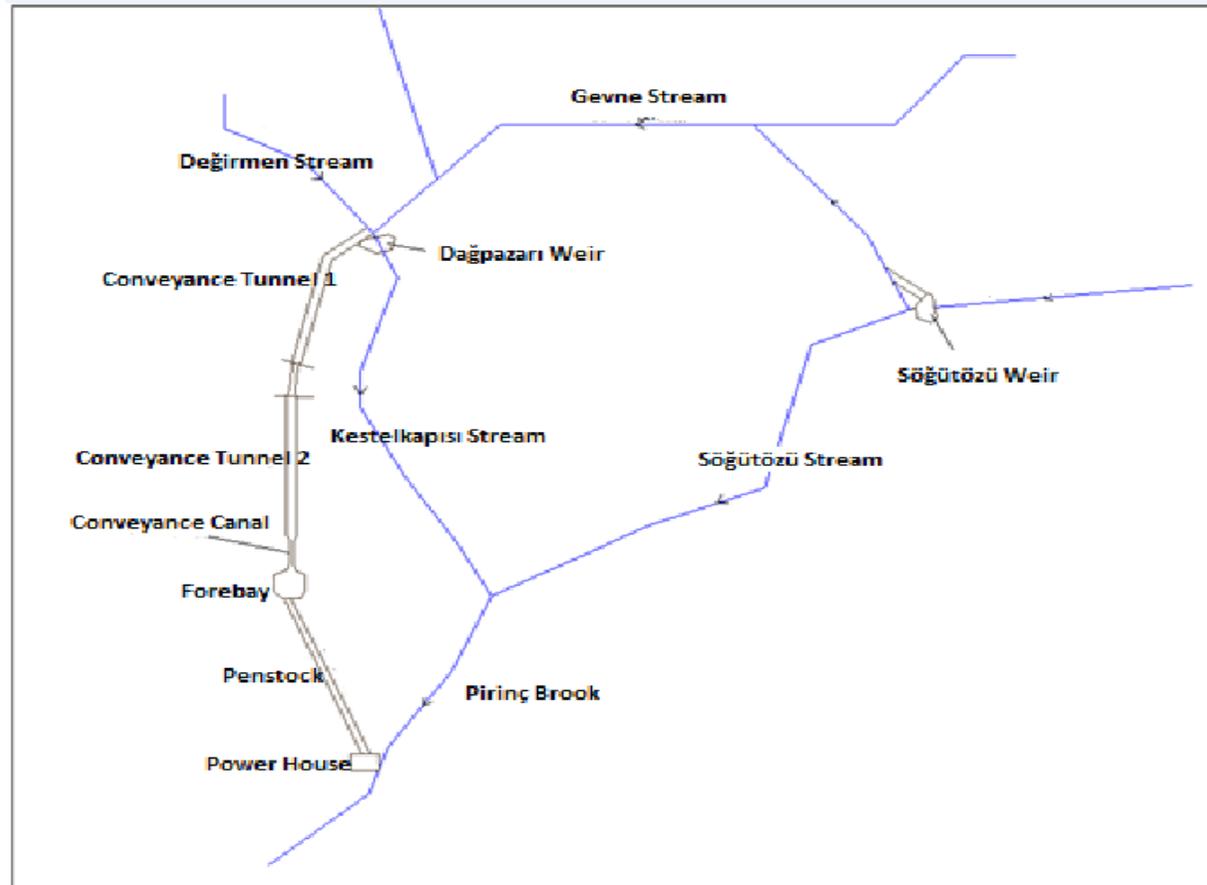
Schematic description of Birkapılı HEPP facilities and creeks in the vicinity of the project site (plan)
